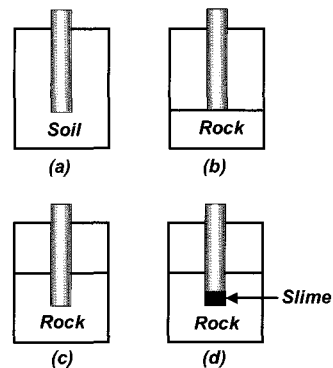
End conditions of drilled shaft in the field: (a) free end condition; (b) fixed end condition; (c) rock-socketed condition; and (d) soft bottom condition
